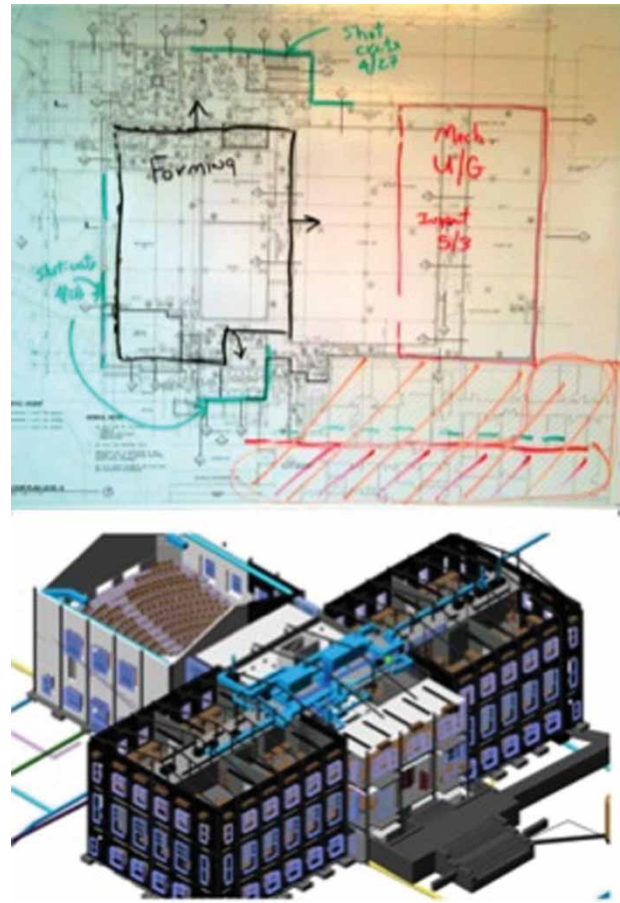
Examples of whiteboard 2D plan with sketch and a 3D BIM
